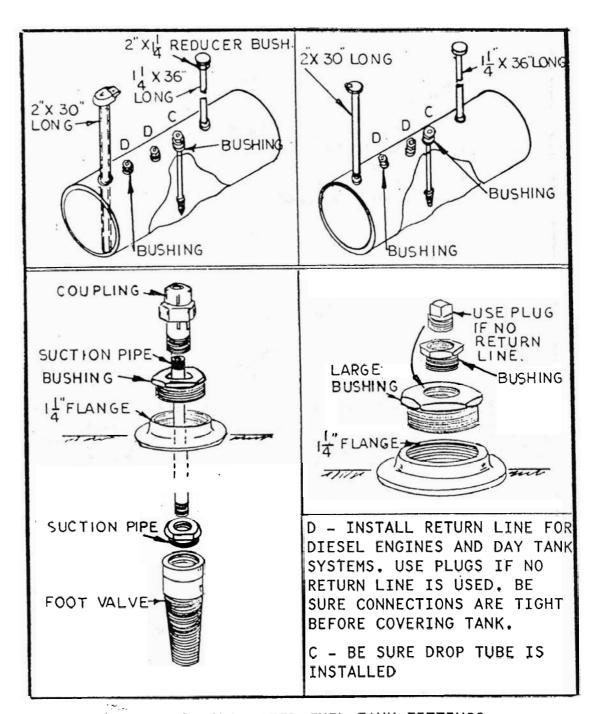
SUGGESTED FUEL TANK FITTINGS
